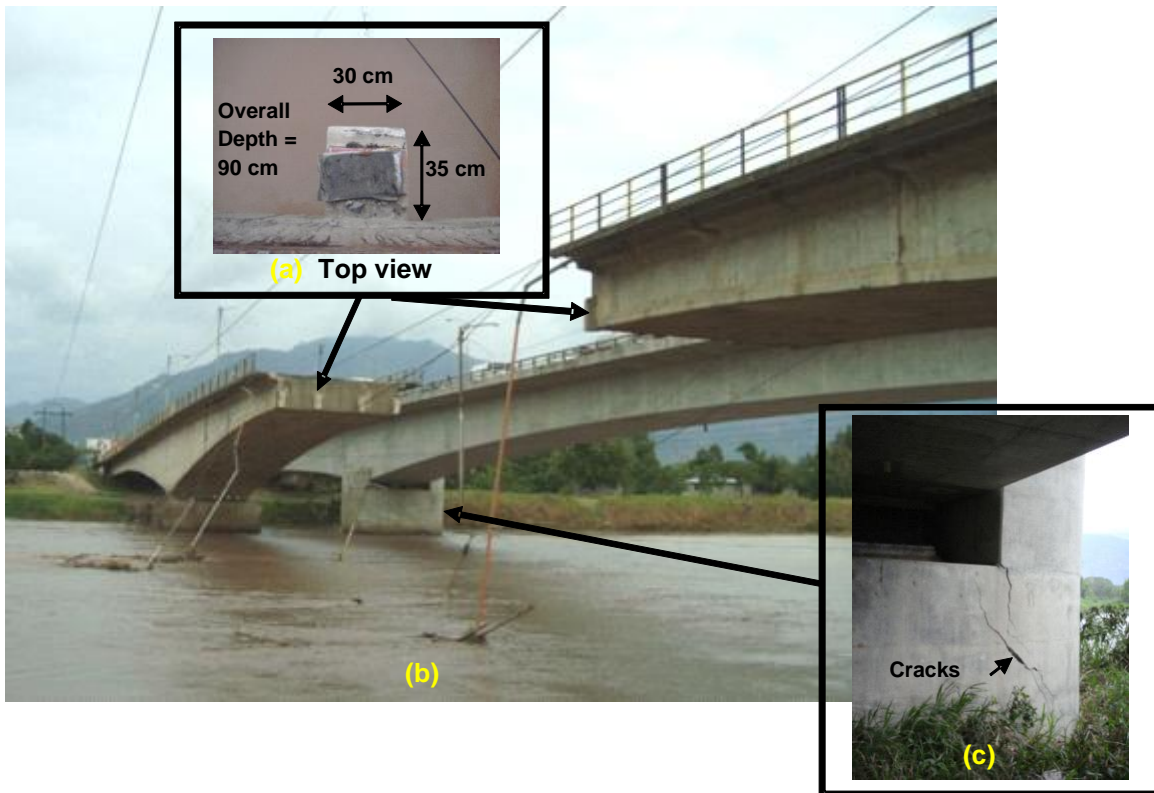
La Democracia twin-bridge with middle span collapsed.
